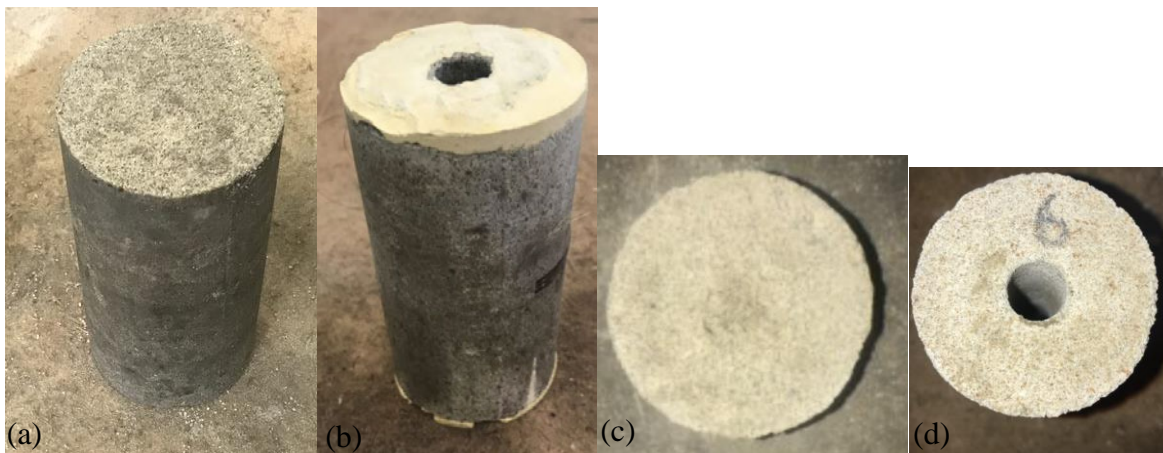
(a) Cylinder sample side view, (b) TWHC sample side view, (c) Cylinder sample top view (d) TWHC sample top view
